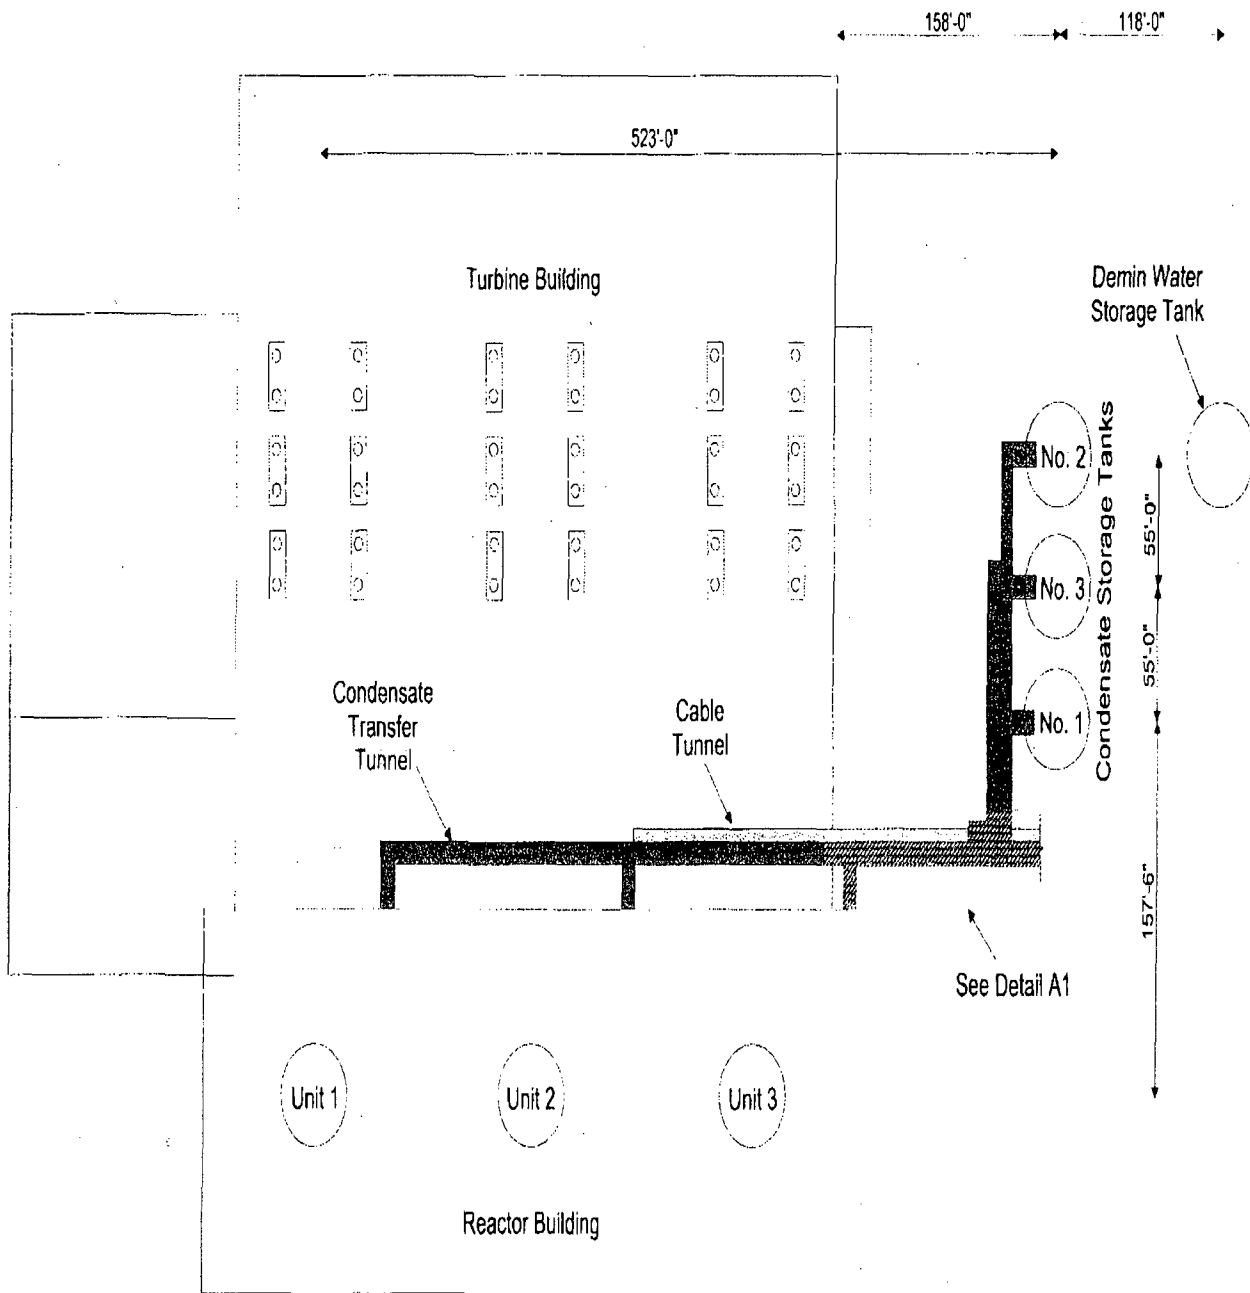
Plan View Schematic of Condensate Transfer Tunnel and Cable Tunnel (adapted from TVA Design Drawing 0-17W510)
